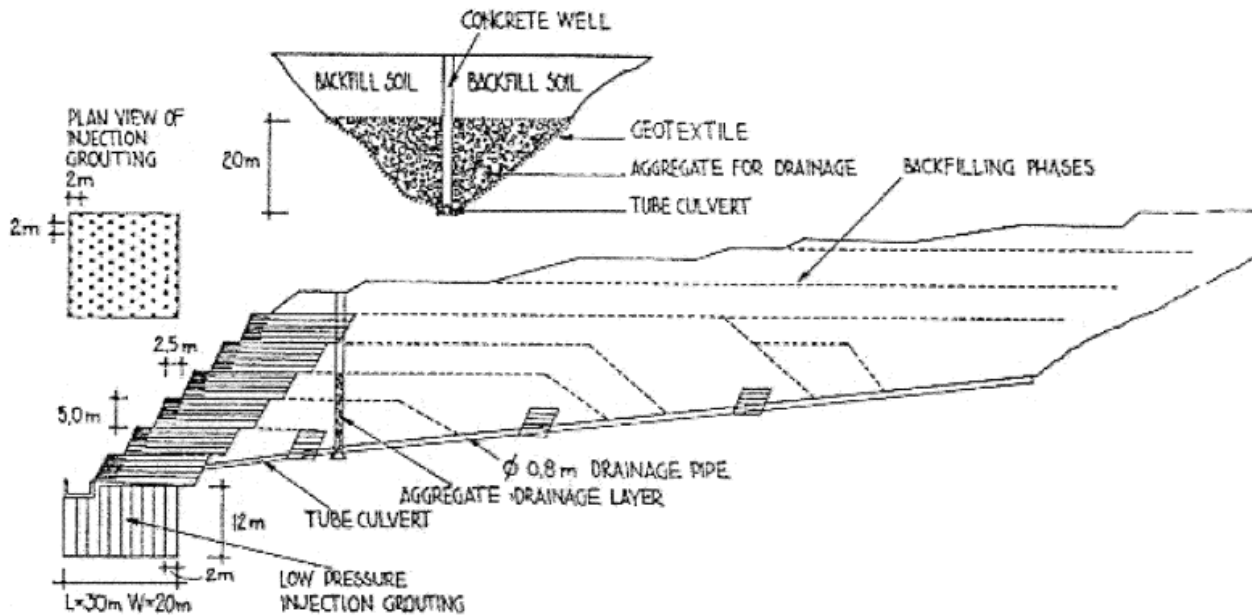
Cross-section of Nai Lu housing development site (Chou et al., 1995).
